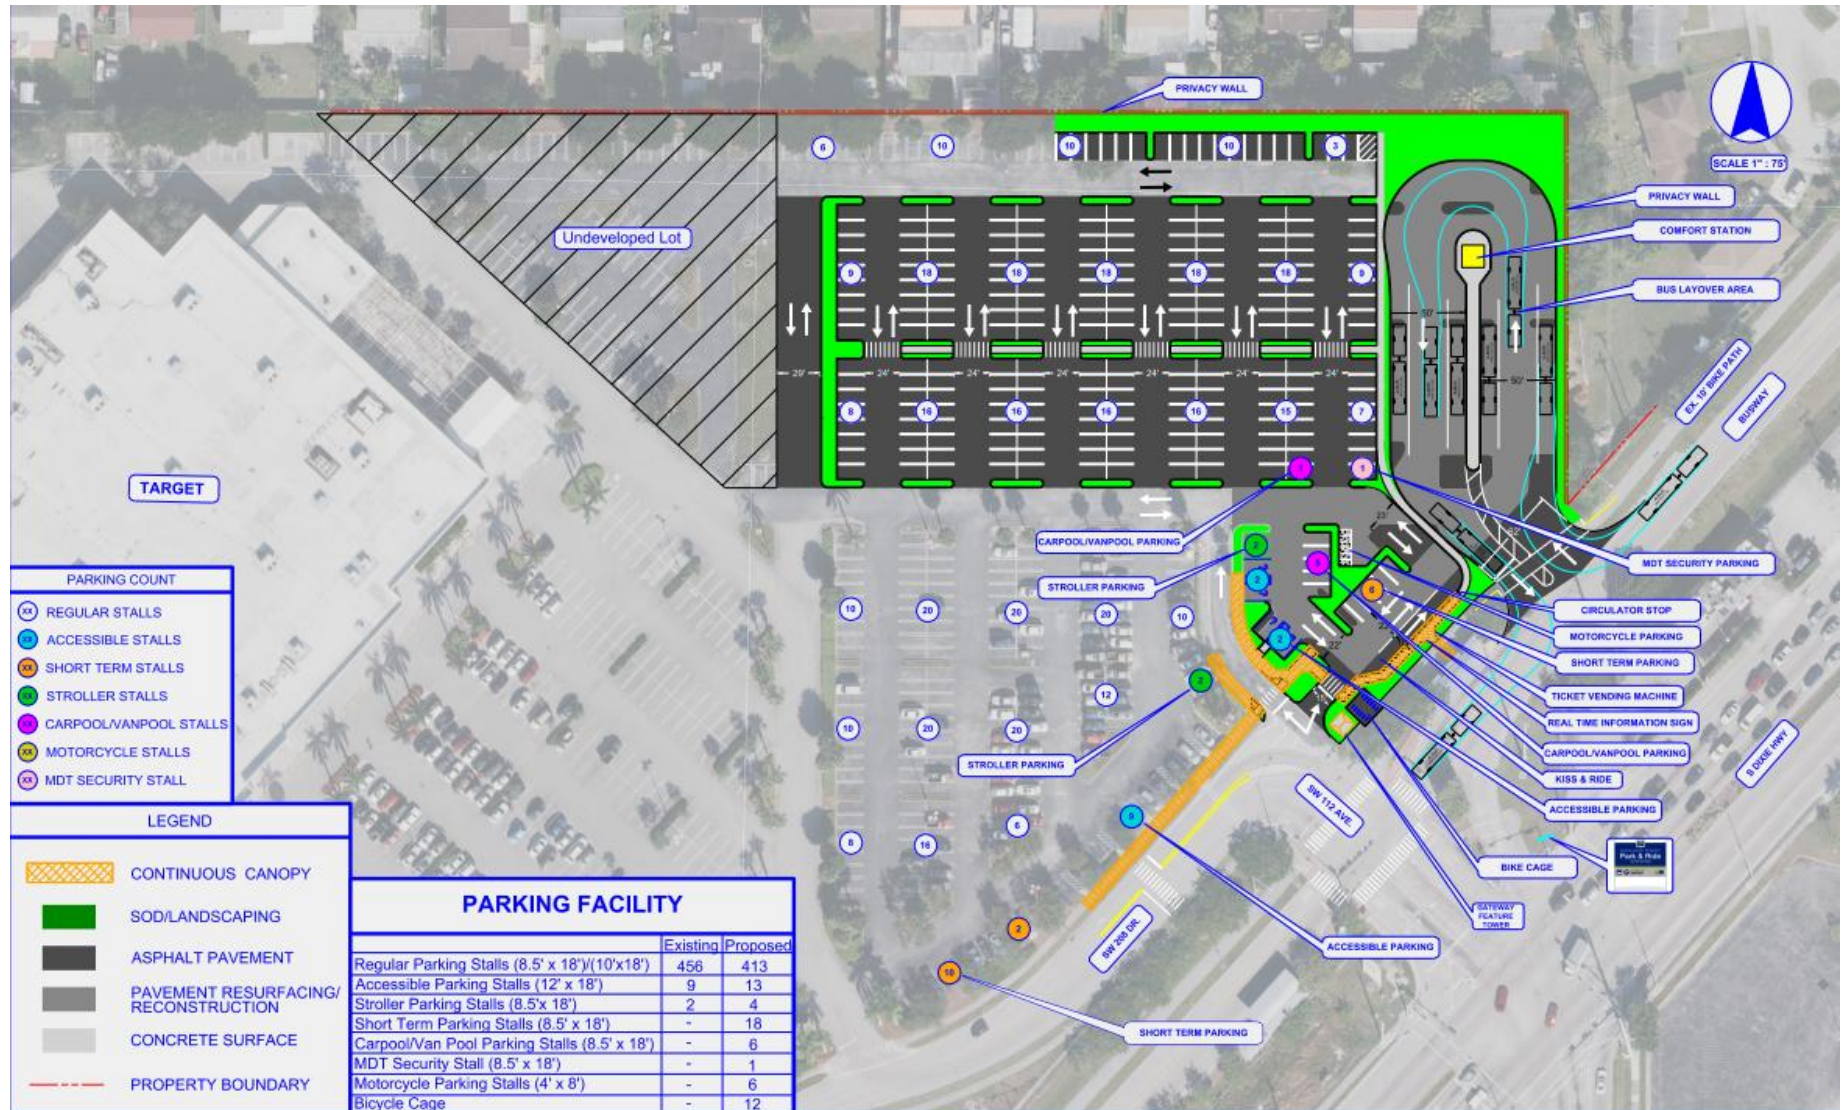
Busway Park-and-Ride at SW 244th Street Proposed Improvement Plan
